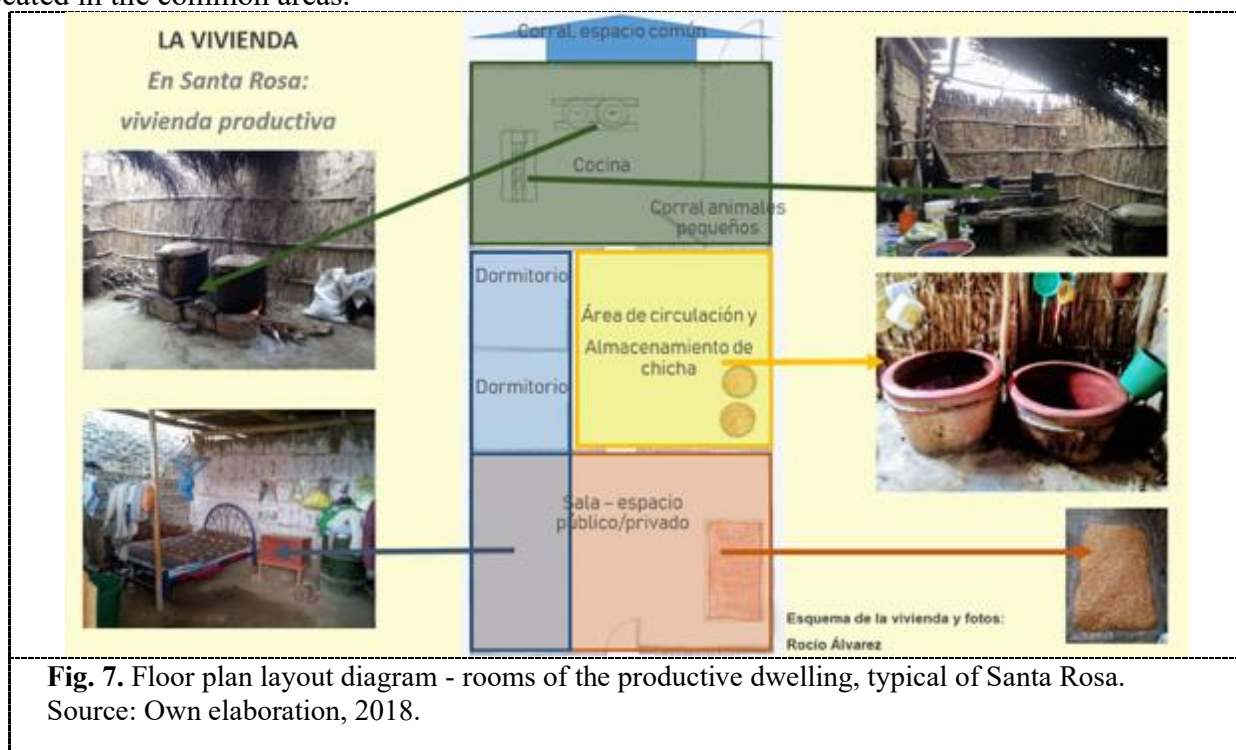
Floor plan layout diagram - rooms of the productive dwelling, typical of Santa Rosa.
